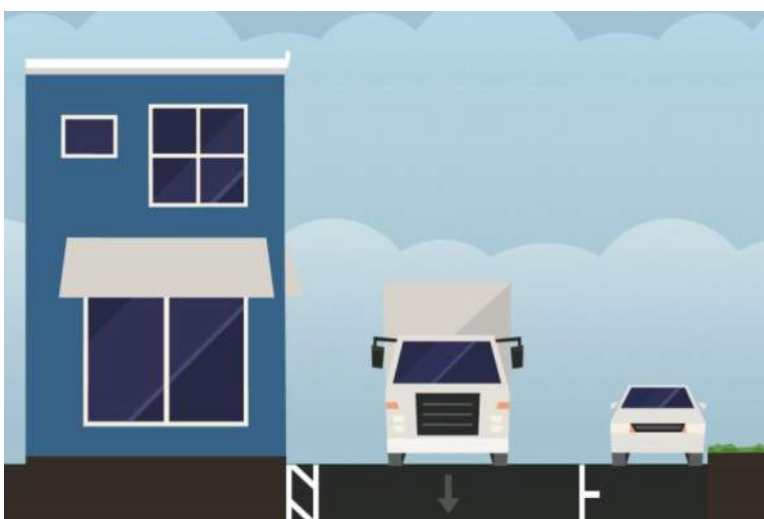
Existing Cross-section Looking West on E 1st Street (Source: www.streetmix.net)
